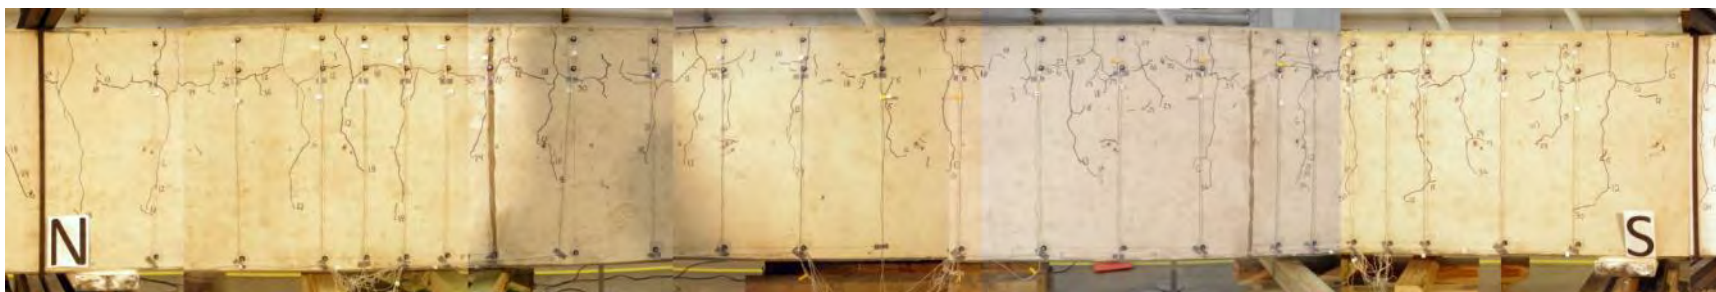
West Elevation of Test Girder A4. Initial Loading. Applied Load = 36 kip
